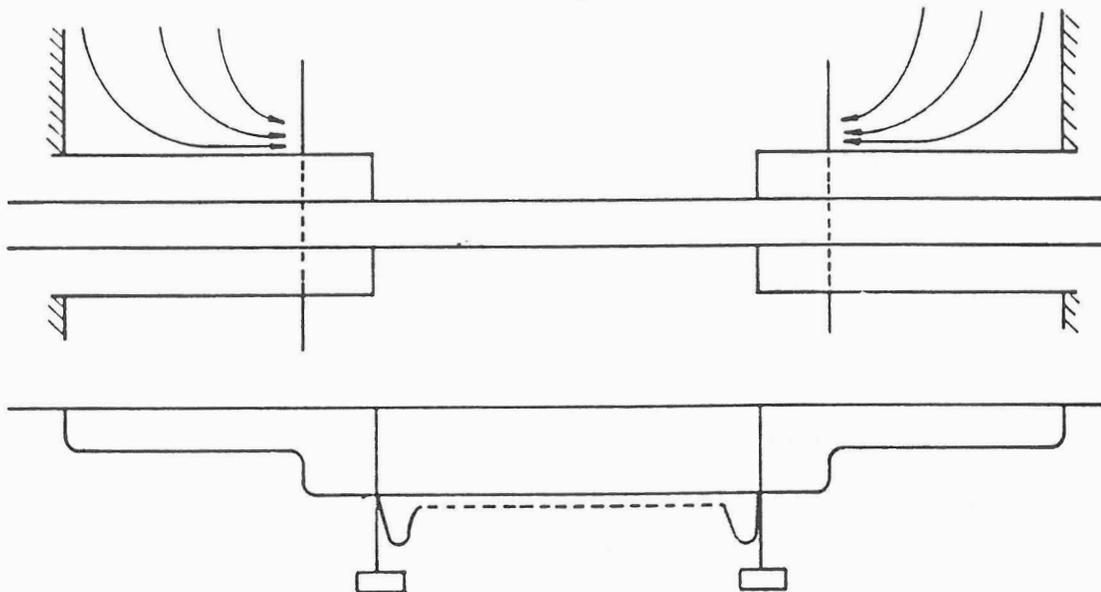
BRIDGE ABUTMENT IN MAIN CHANNEL AND OVERBANK FLOW
